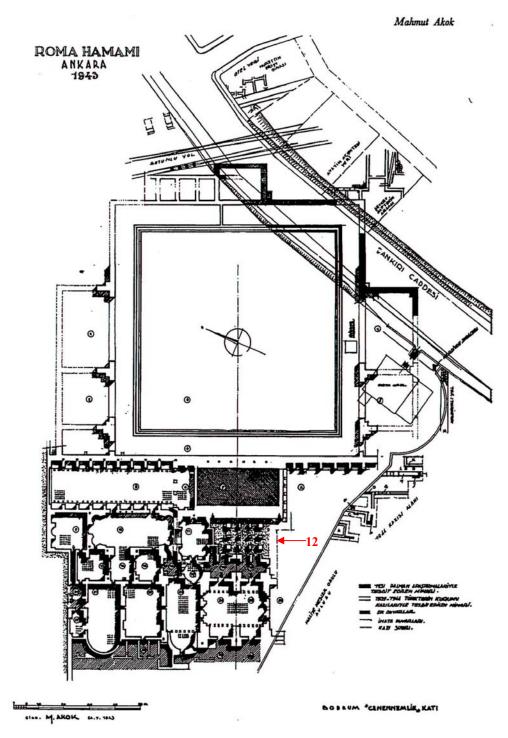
Foundation plan of the Roman Bath at Çankırıkapı, noting no:12 for the location of the suggested water tank/reservoir (Source: Akok 1968:25).
